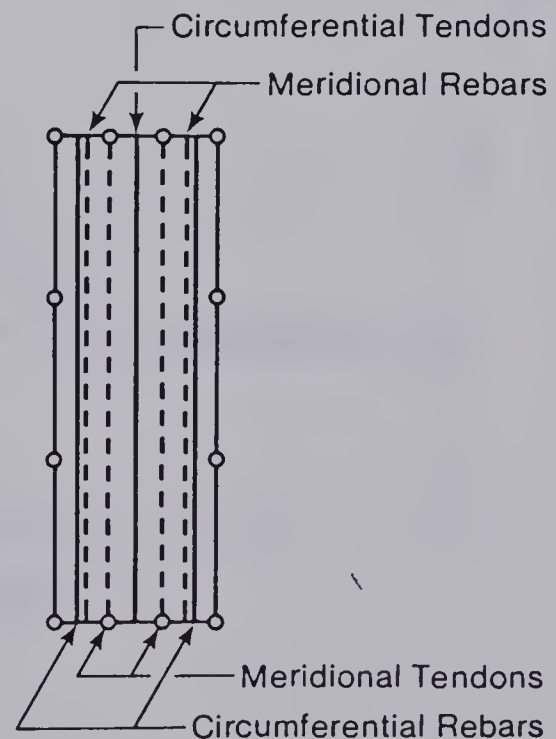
Reinforcing and Prestressing Layers of Wall Segment Finite Element Model
